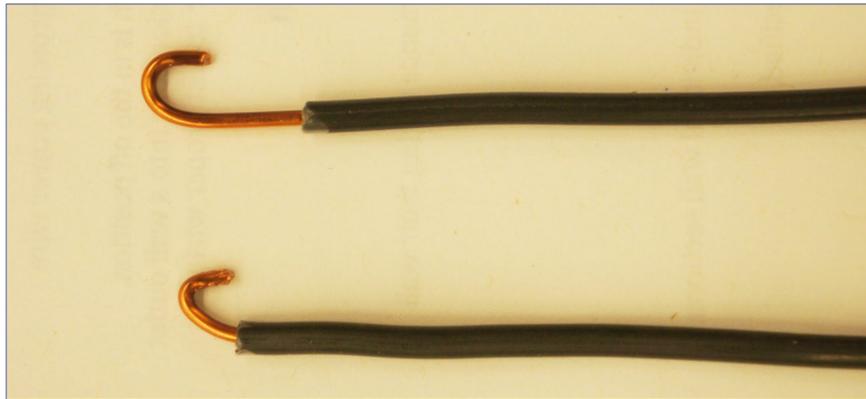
Bad hooks (too little insulation stripped and too much stripped)
